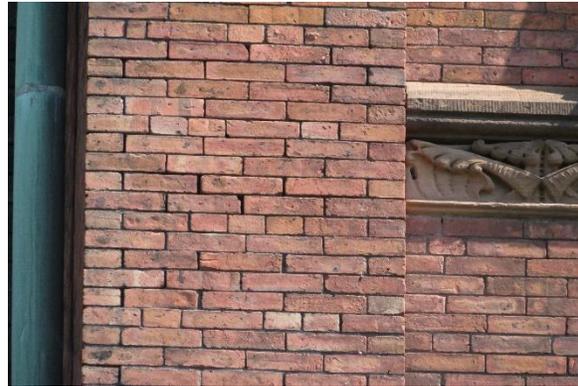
South façade: Open mortar joints. Loose brick masonry.
